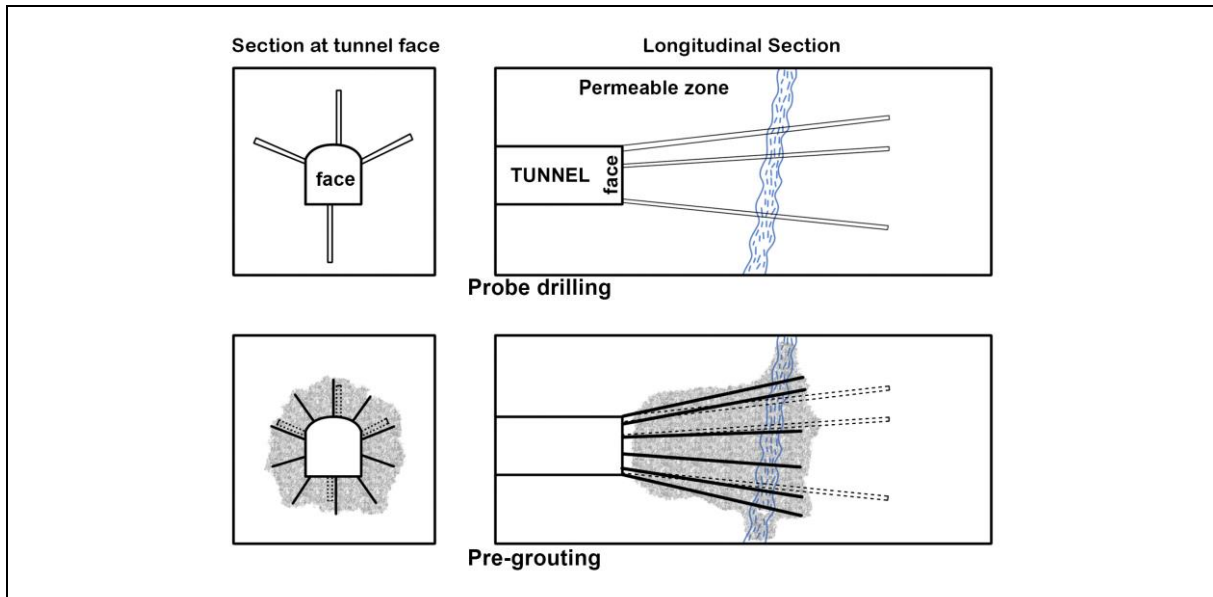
Probe Drilling and Pre-grouting ahead of Tunnel Advancing Face or Cavern Heading
